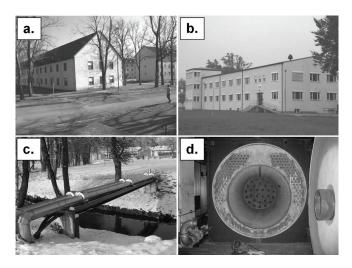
(a and b) Buildings were constructed soundly, but had poor insulation and inefficient heating; (c) district heating pipes were in well maintainea condition, but (d) boilers were oversized (image used courtesy of RK-Stuttgart Architecture and Energy Design).
